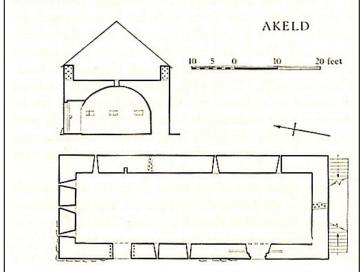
A Plan of Akeld bastle, 1970 (AK M&D 020)
